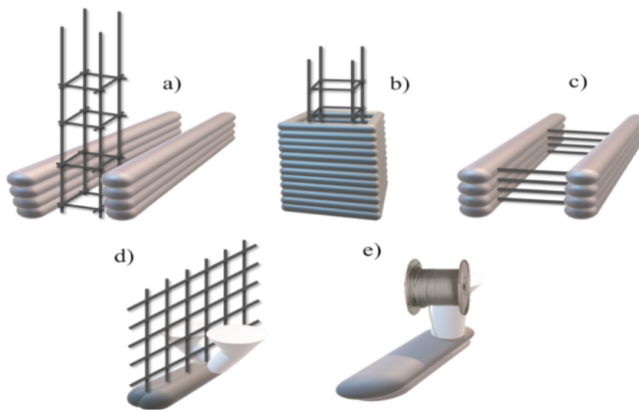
Designs of structures for printing: a,b) channels with vertically-positioned steel reinforcements; c) channel supported by horizontally-positioned steel reinforcements; d) wall supported by a pre-fabricated steel grid with laying concrete at both sides and e) layers reinforced with a flexible steel cable inserted during printing using a spool-like device.
